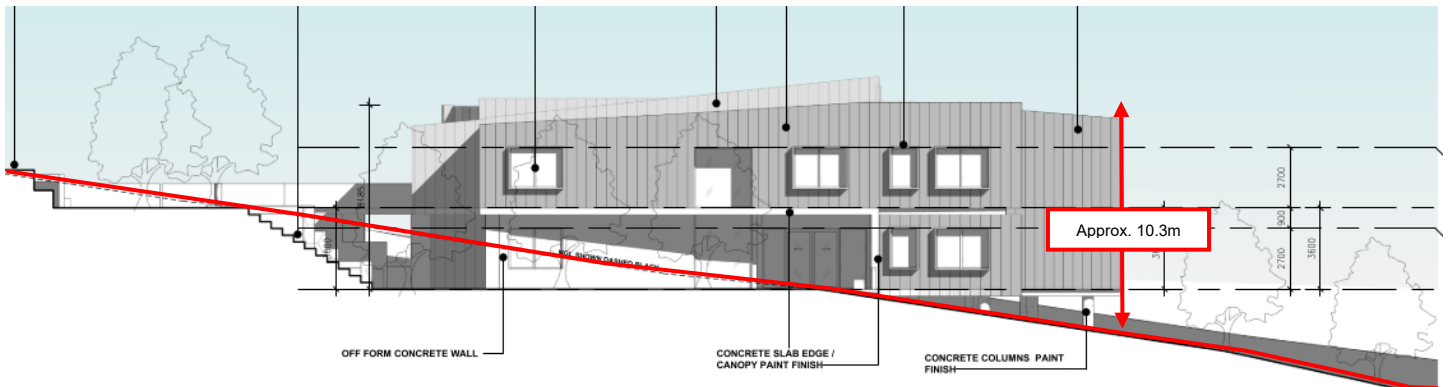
Extract of the eastern elevation showing the overall 2-storey building showing its relationship with the natural ground level (outlined in red)
